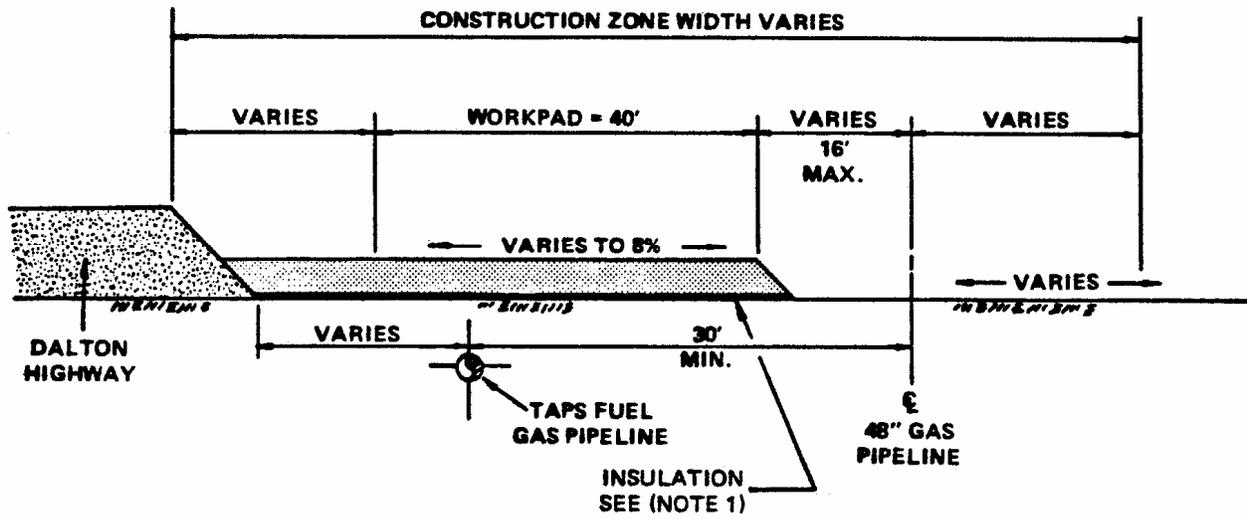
Typical Section at TAPS Fuel Gas Pipeline
